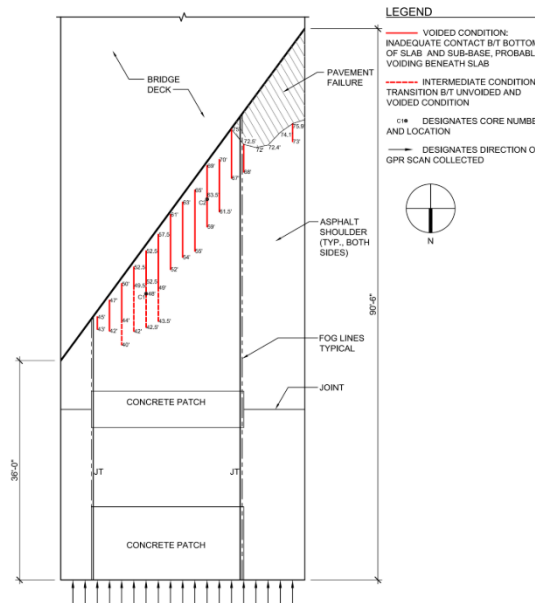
Plan View of Severe Voiding (WJE, 2011)
